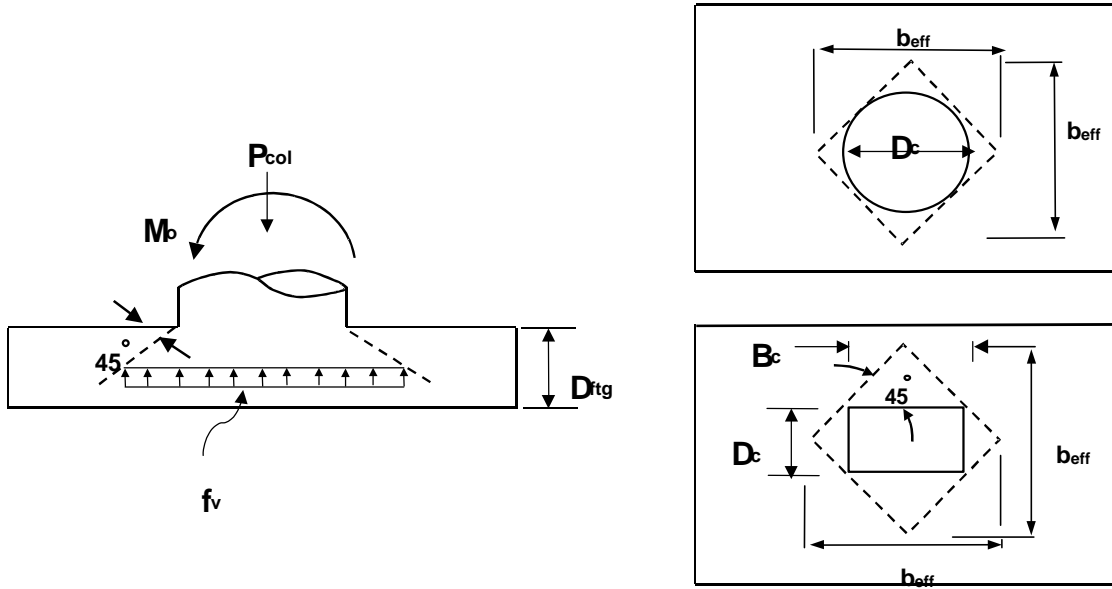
Effective Joint Width for Footing Joint Stress Calculation
